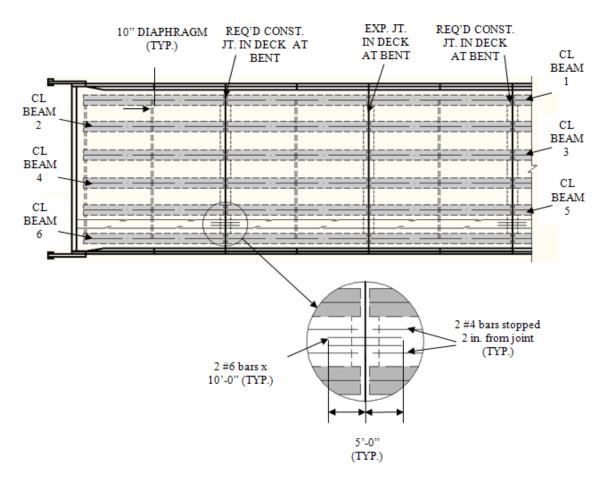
Plan view of current continuous bridge deck (modified from GDOT SR 46 Over Oconee R. plan)
